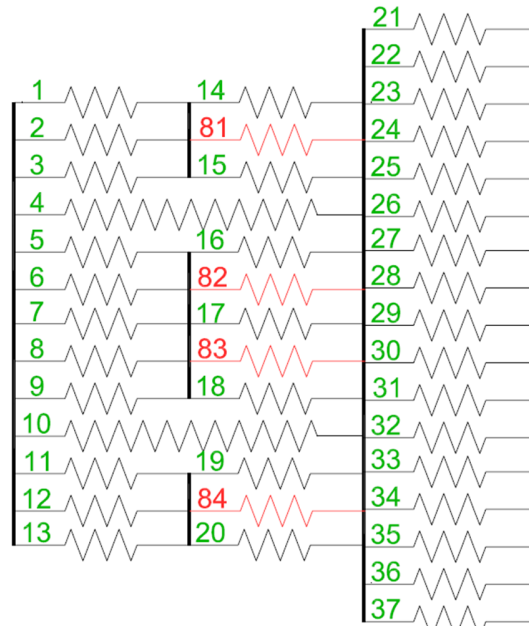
Assemblage of Masonry Piers of First Storey Wall in the Retrofitted Situation
